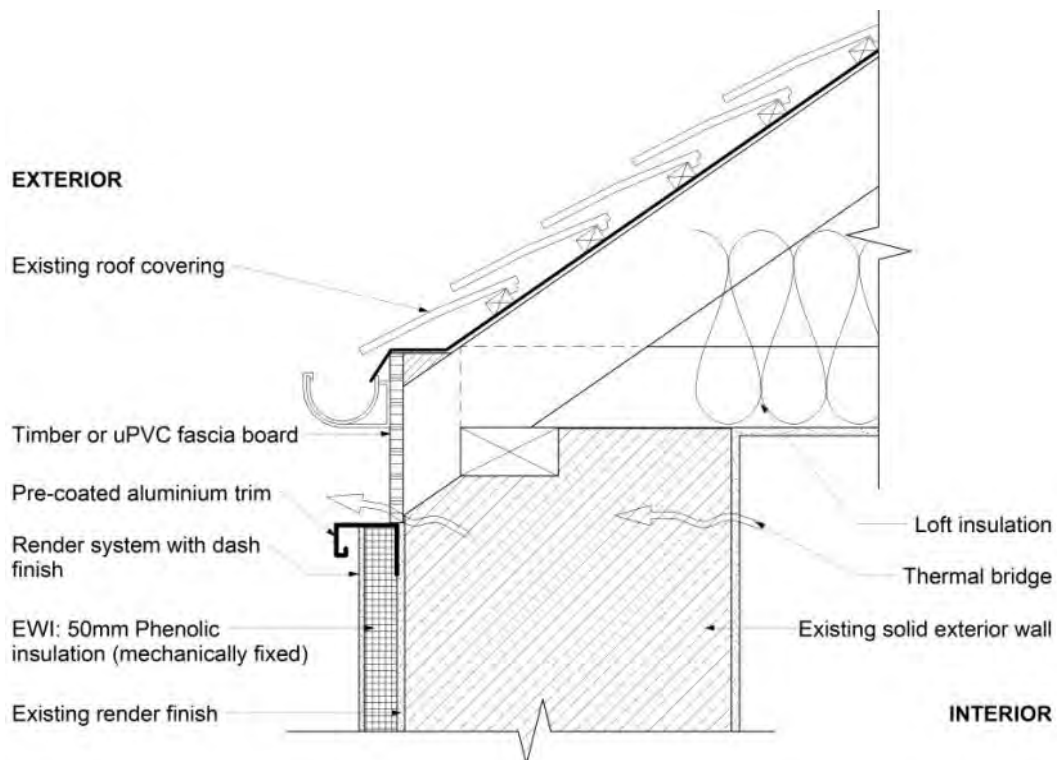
Eaves section detail as observed on site (Hopper, 2012)
